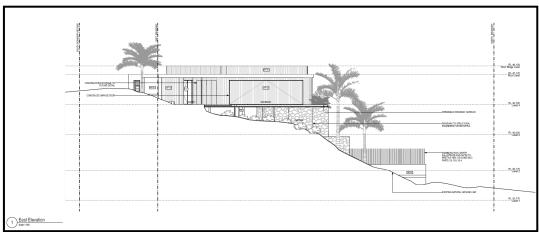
Excerpt East Elevation Plan, illustrating single storey presentation to the streetscape
